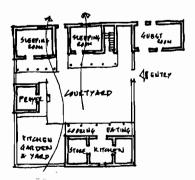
Typical 'Bengali house' layout (Source: Ghosh, 1988, p.83)
